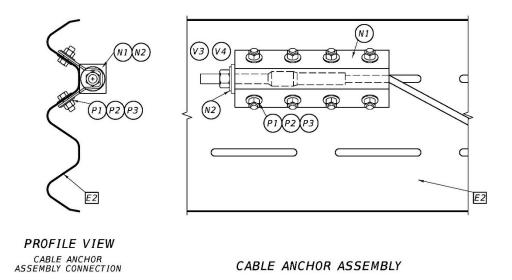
Diagram of Cable Anchor Assembly Profile View and Plan View
